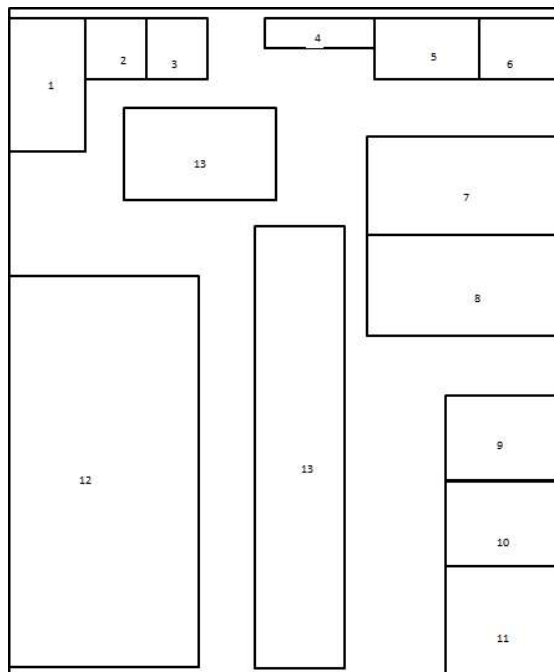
16 Floor plan basemant Latar Ijen Resto & Coffeeshop
